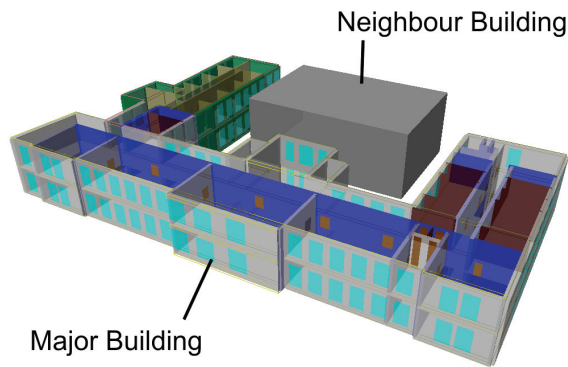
Database of a historical office building (major building) with adjacent office block (neighbour building).
